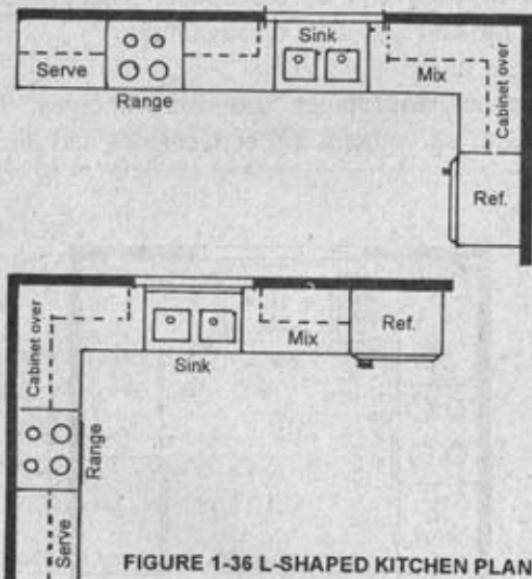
L-SHAPED KITCHEN PLAN
